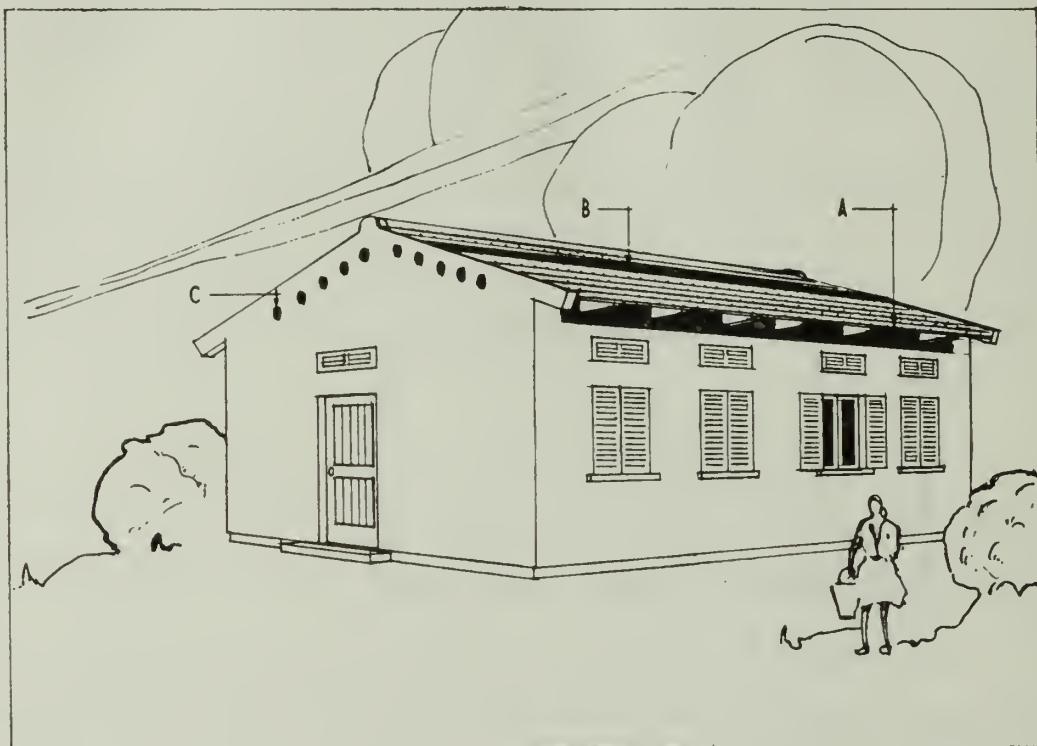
Perspective picture of pitched roof house, showing ventilation arrangements
